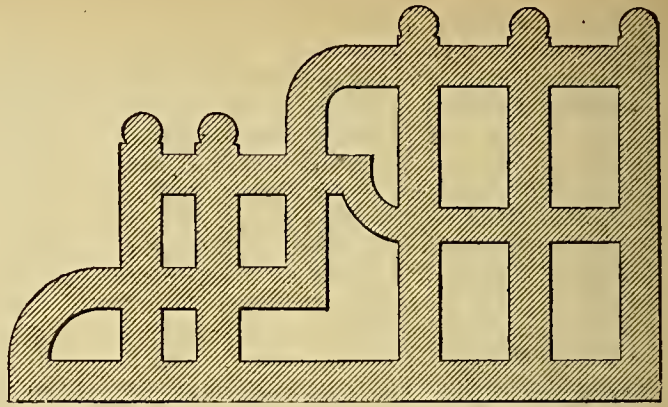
SIDE OF LEDGE AT TOP OF CUPBOARD—HALF SIZE.
